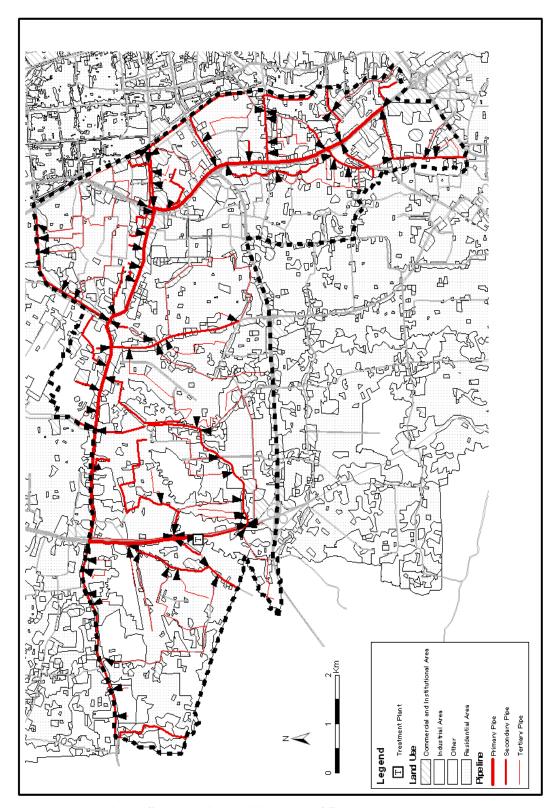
Facility Plan of Sewerage Zone No. 6
